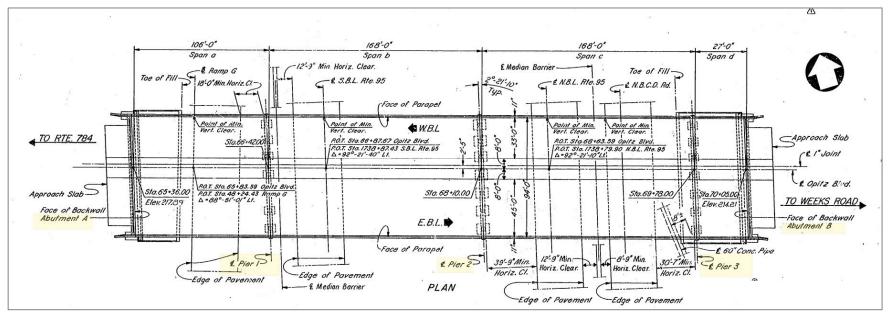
Existing Bridge Plan (Reference: VDOT, 1979, Sheet 1 of 47)
